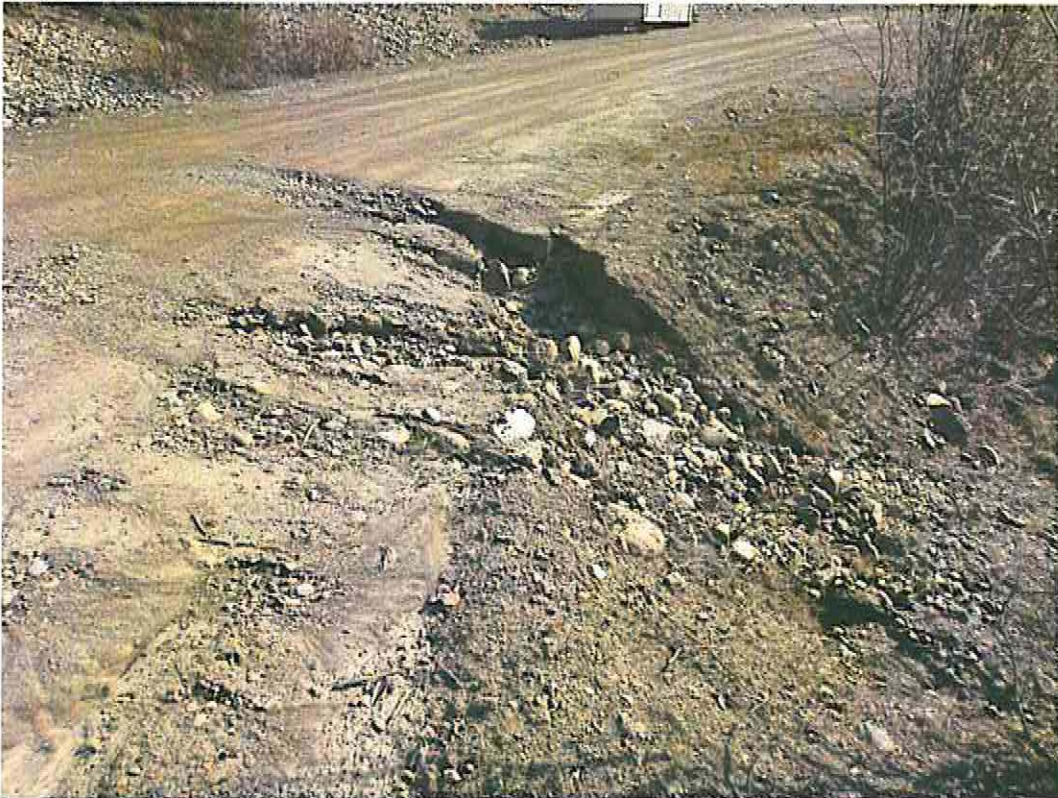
Outlet End of Blocked Culvert V-15 Pond
